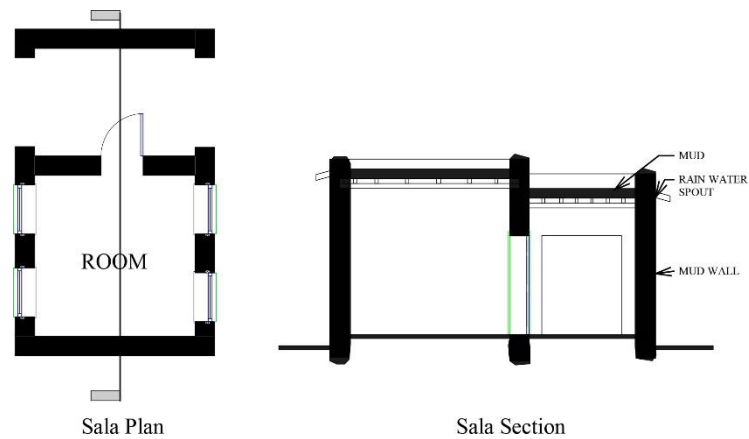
Plan and section of a Sala. Source: (Elias,1970)
